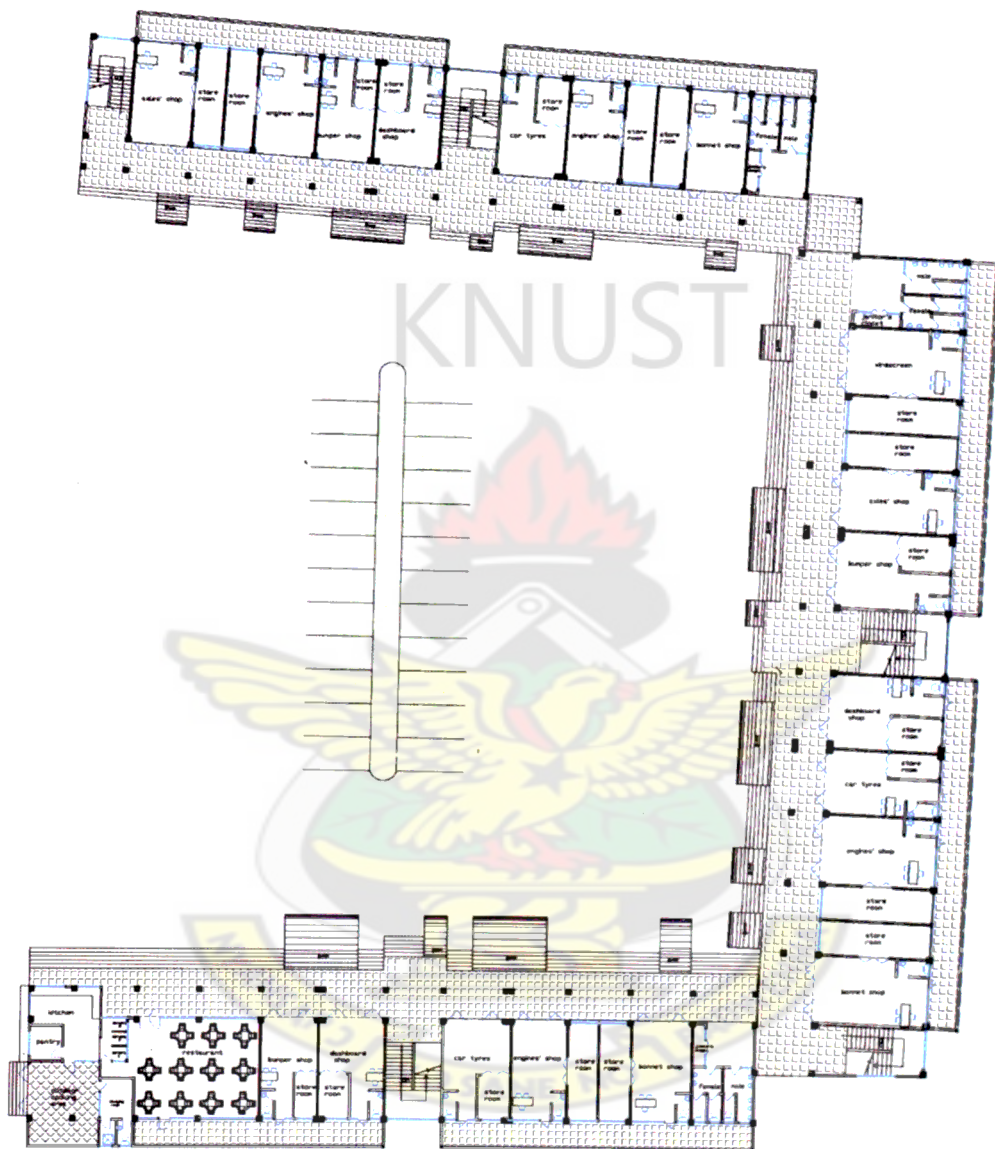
Drawing showing Ground floor plan of spareparts cluster
